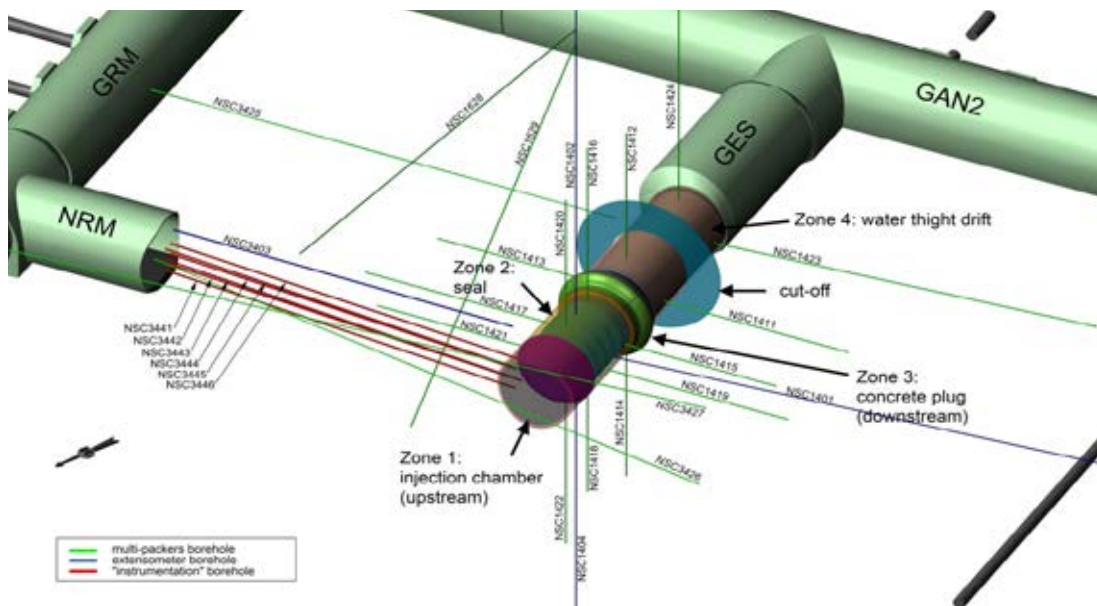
General layout of the NSC experiment in the Andra's URL
